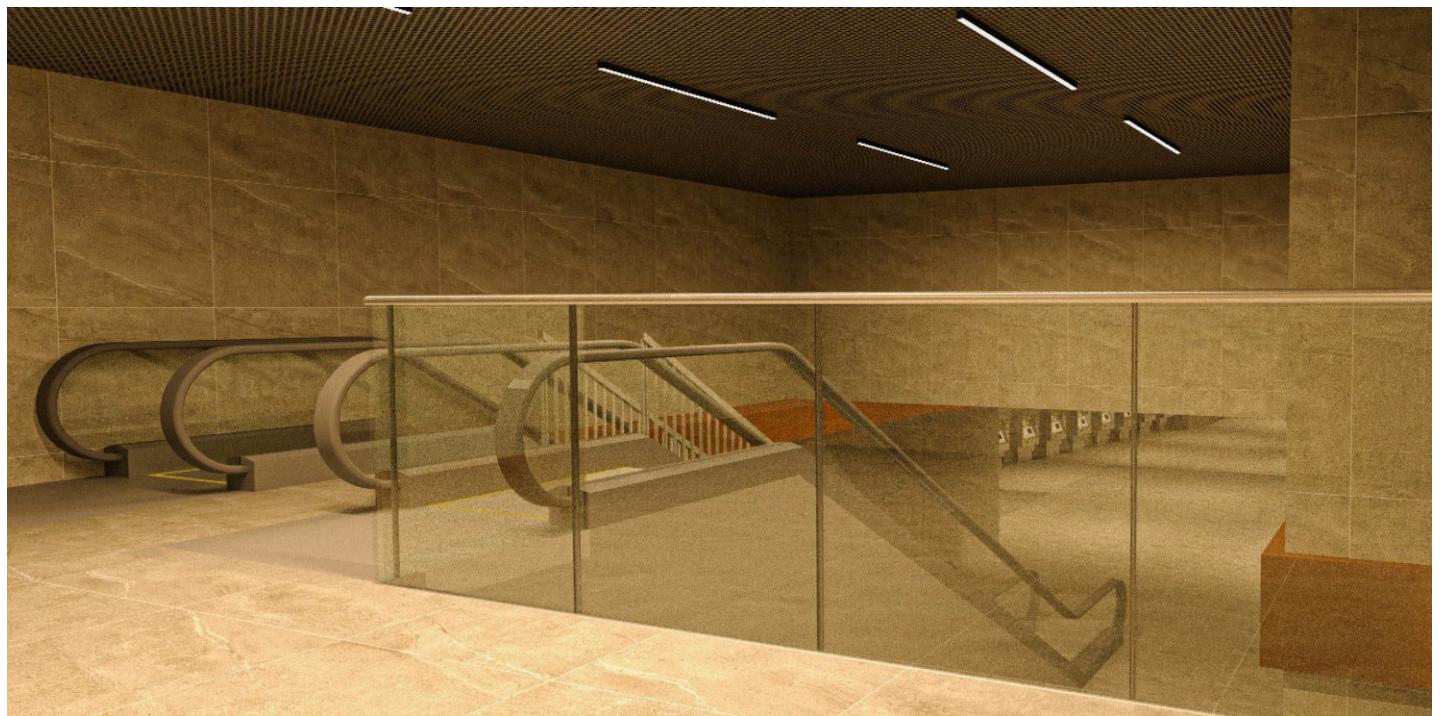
Magen David Metro Station, mezzanino level, exit A to Piazza Magen David.
